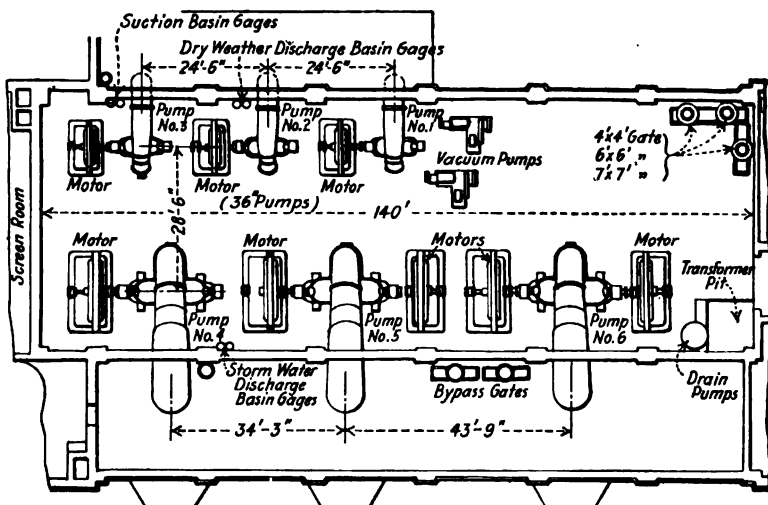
Interior Arrangement of the Calumet Sewage Pumping Station, Chicago.
